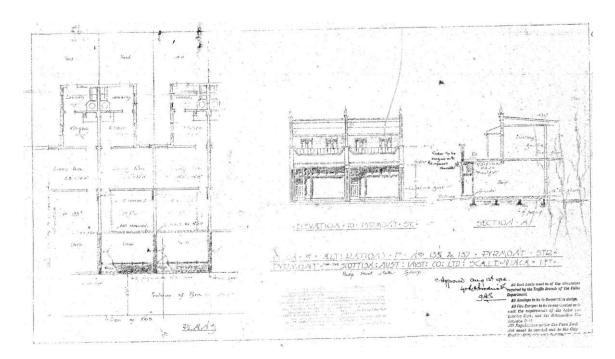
1914 – Plan showing details for the proposed new shopfronts 129 and 131 Pyrmont Street, carried out by E. Spackman for the Scottish Australian Investment Co Ltd. The plan notes the wrong address but was submitted as part of BA 609/14. These buildings were occupied by a restaurant (No. 131, on left) and hairdresser (No. 129, on right) (Source: City of Sydney Archives, Pyrmont St (129-131) E Spackman alterations & additions (01/01/1914 - 31/12/1914), [A-00571870]. https://archives.cityofsydney.nsw.gov.au/nodes/view/1436278)
